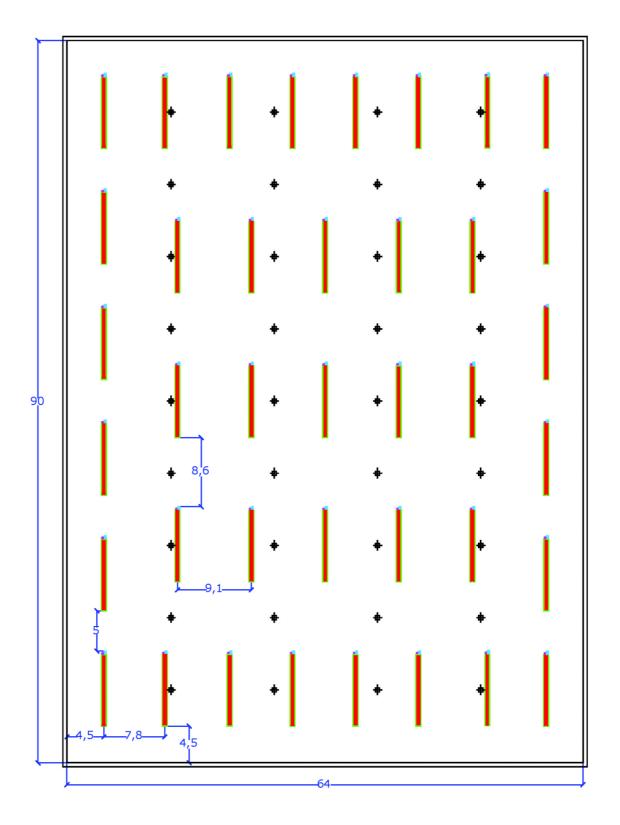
Distribution (with reinforcement of outer walls) EURAD MSC 9 L 25 kW units
